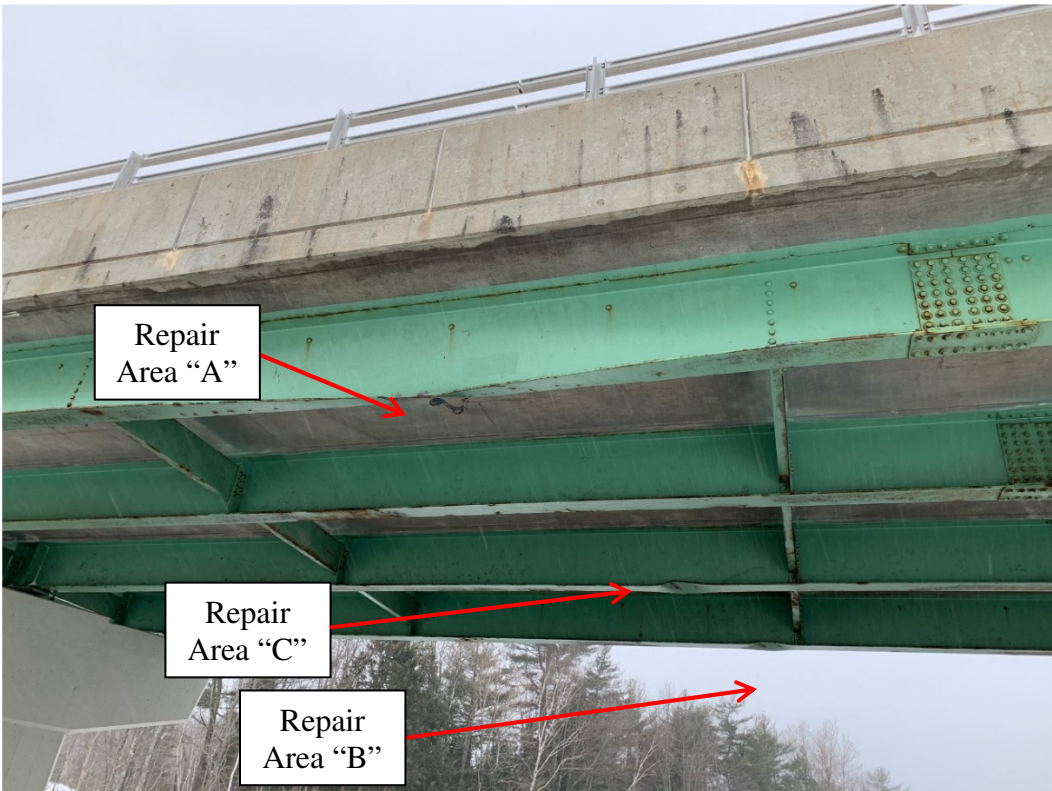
Girder G1, G3, and G4 Collision Damage – Looking South
